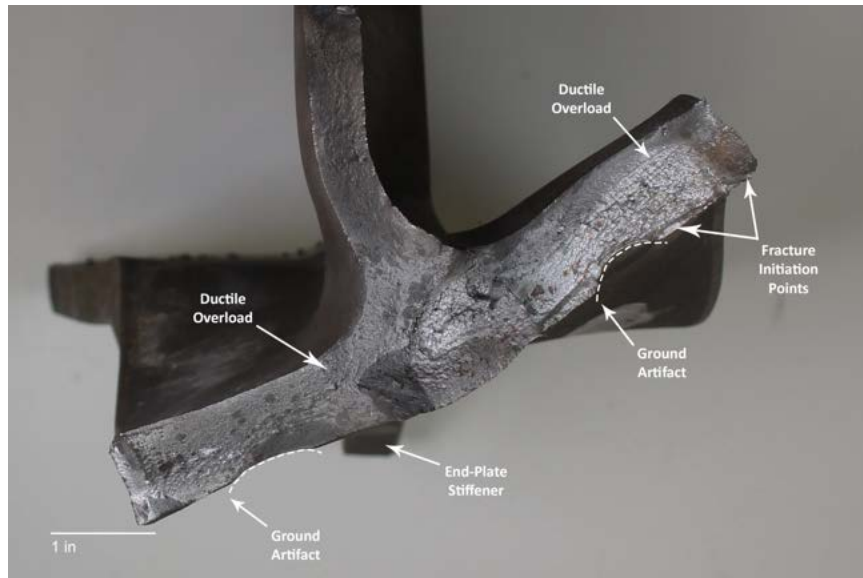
W36RBS-0.125NGT-T94 bottom flange fracture looking towards the end-plate.
